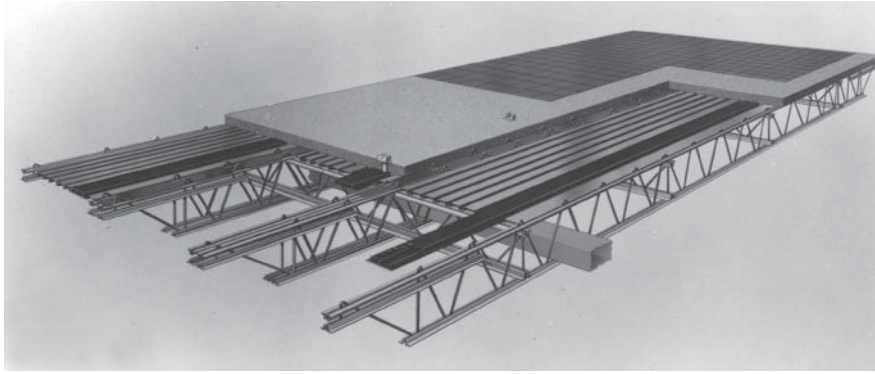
Composite truss-panel system prefabricated by Laclede Steel Company.
